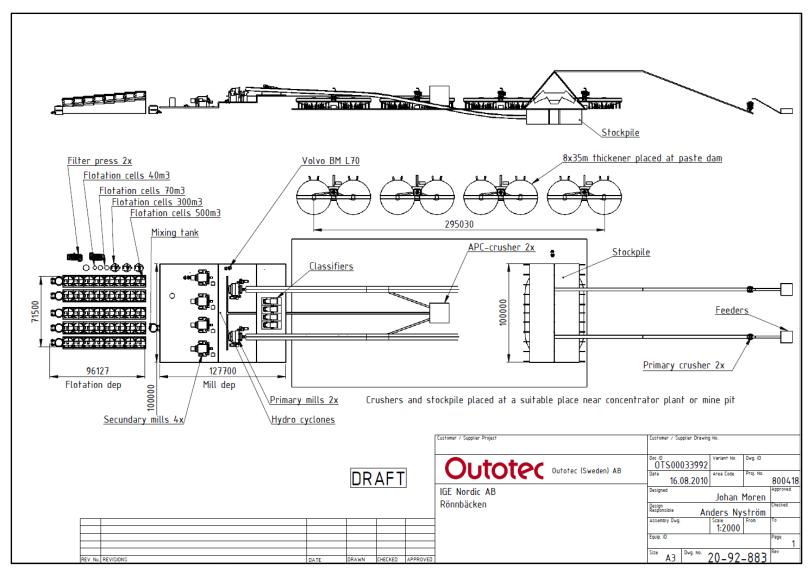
Process Plant Layout (Outotec Sweden AB)
